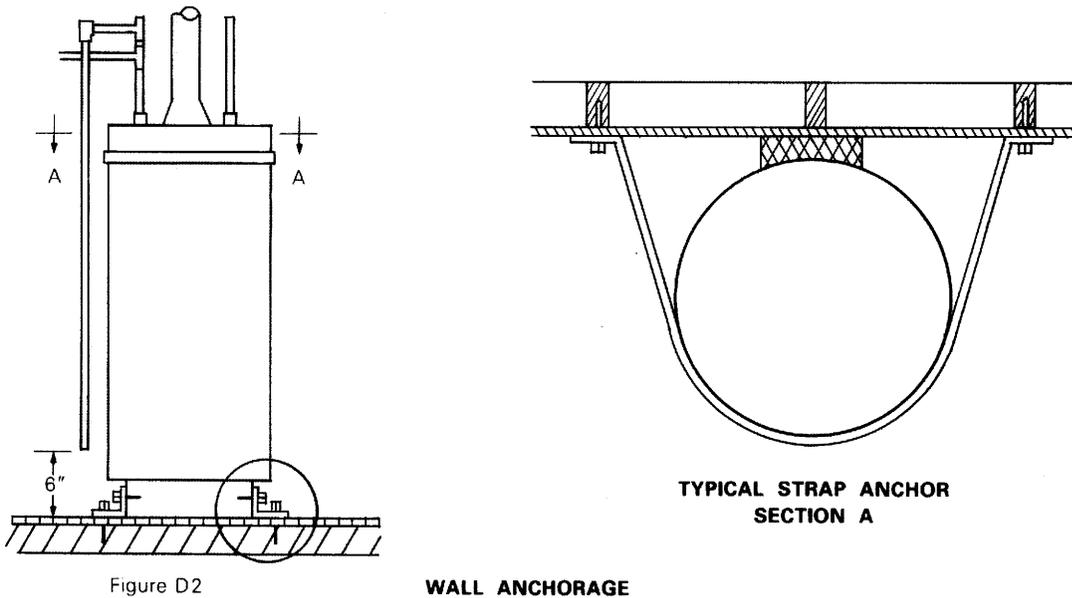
Part of the earthquake anchorage guide prepared and distributed by the Redwood City Building Department (1974) to applicants for water-heater installations. Use of the guide ensures compliance with section 9.136 of the building code, shown in figure 43.
